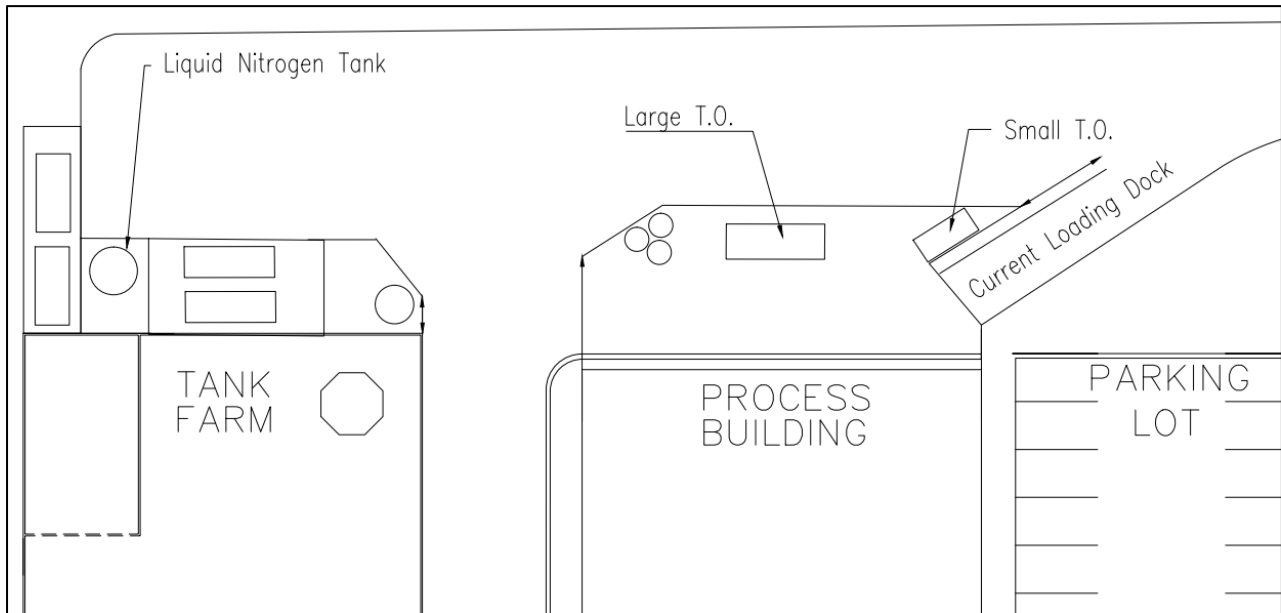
Current Site Plan of Cooling System at Ever Cat Fuels
